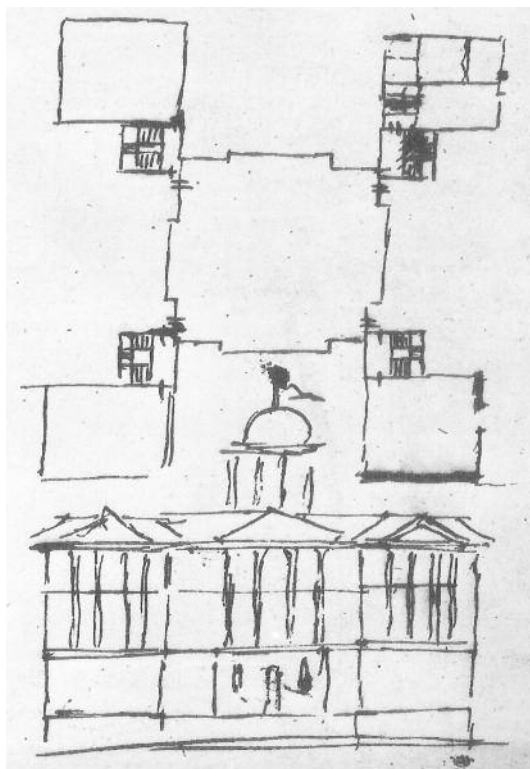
John Webb. A sketch and plan for the proposed remodelling of the Queen's House, Greenwich; William Cleere made a model of these proposed alterations in 1667.
